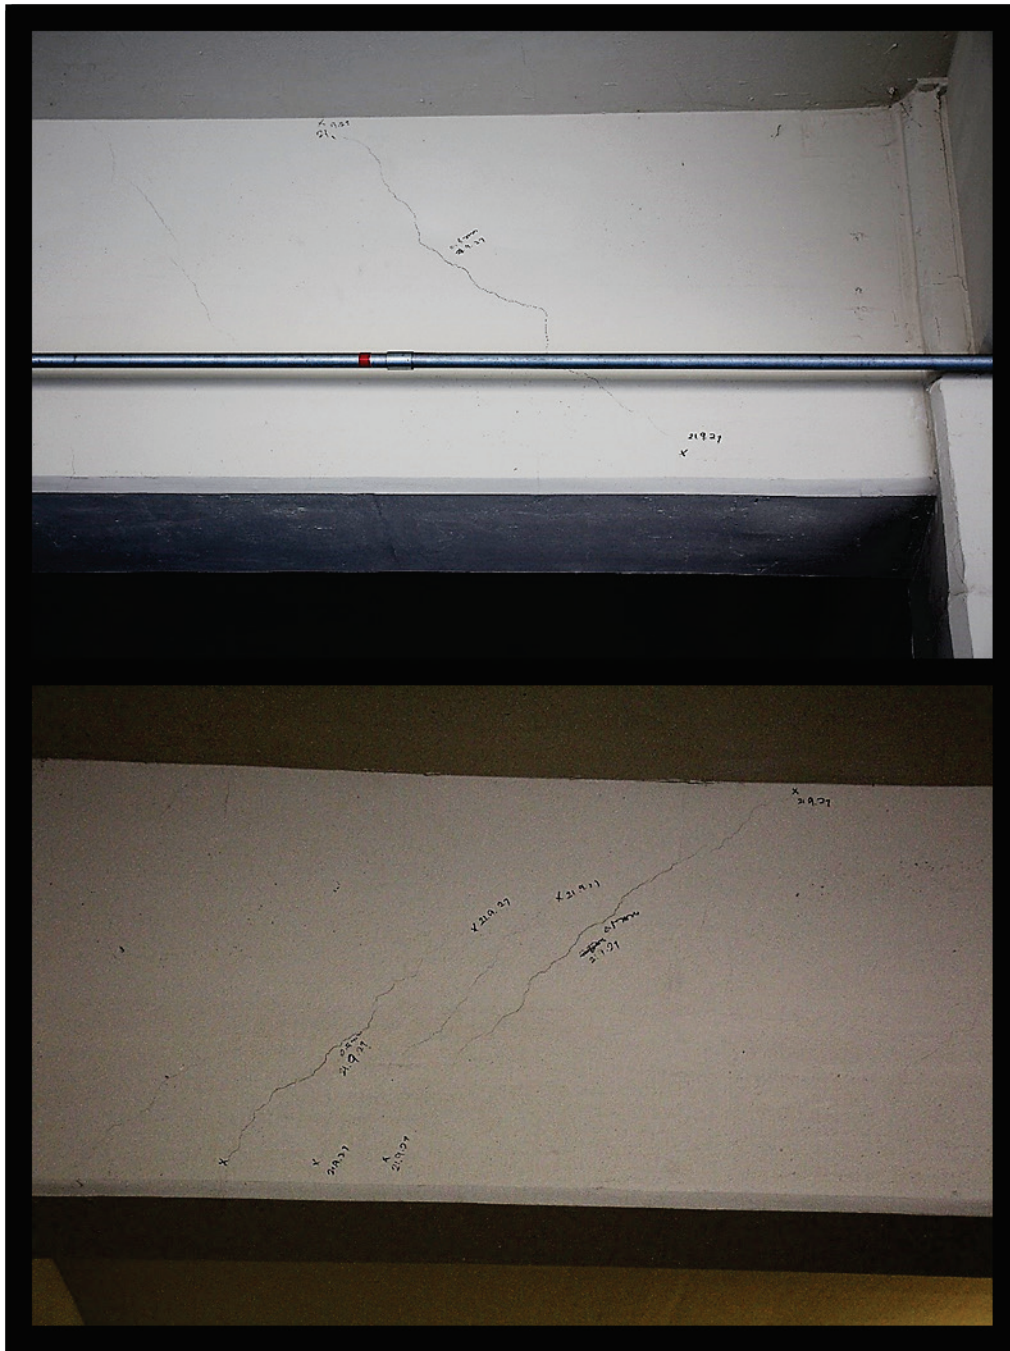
Diagonal cracks in walls in Parking Garage 1.
